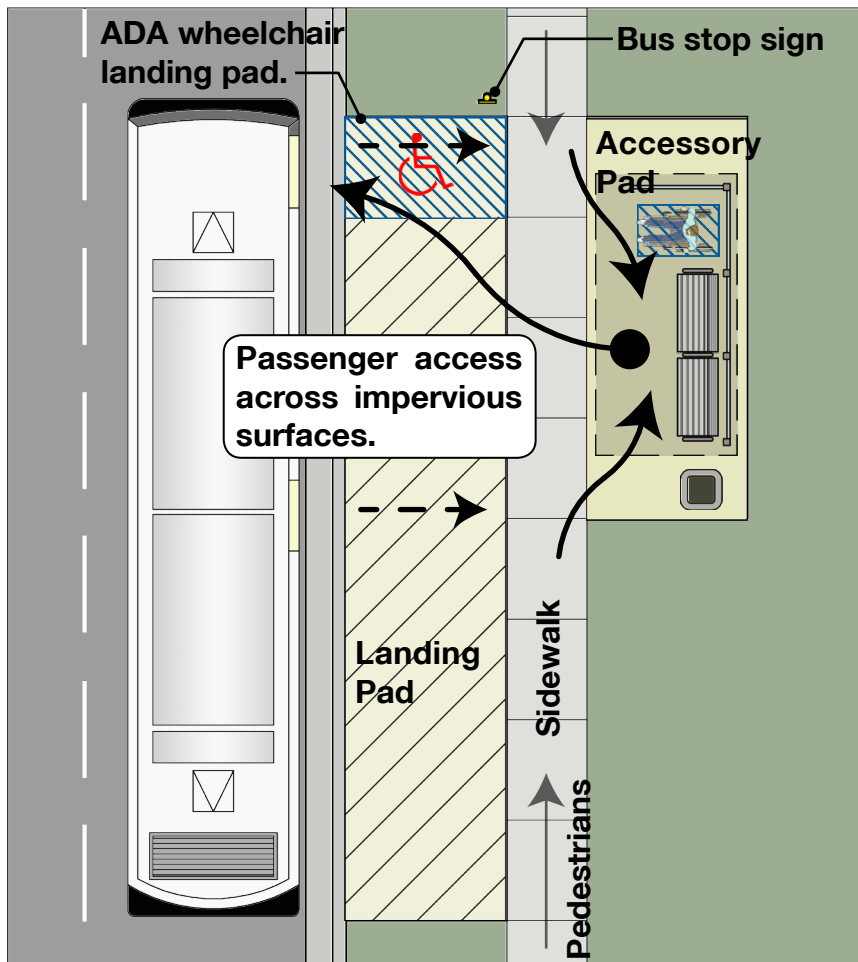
Connection to Sidewalk - Amenities Behind
